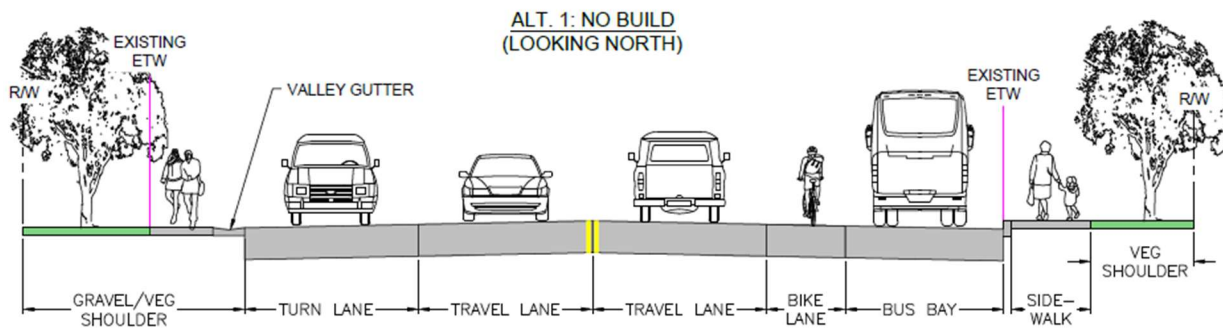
Ringwood Avenue Alternative 1 Near MAHS
